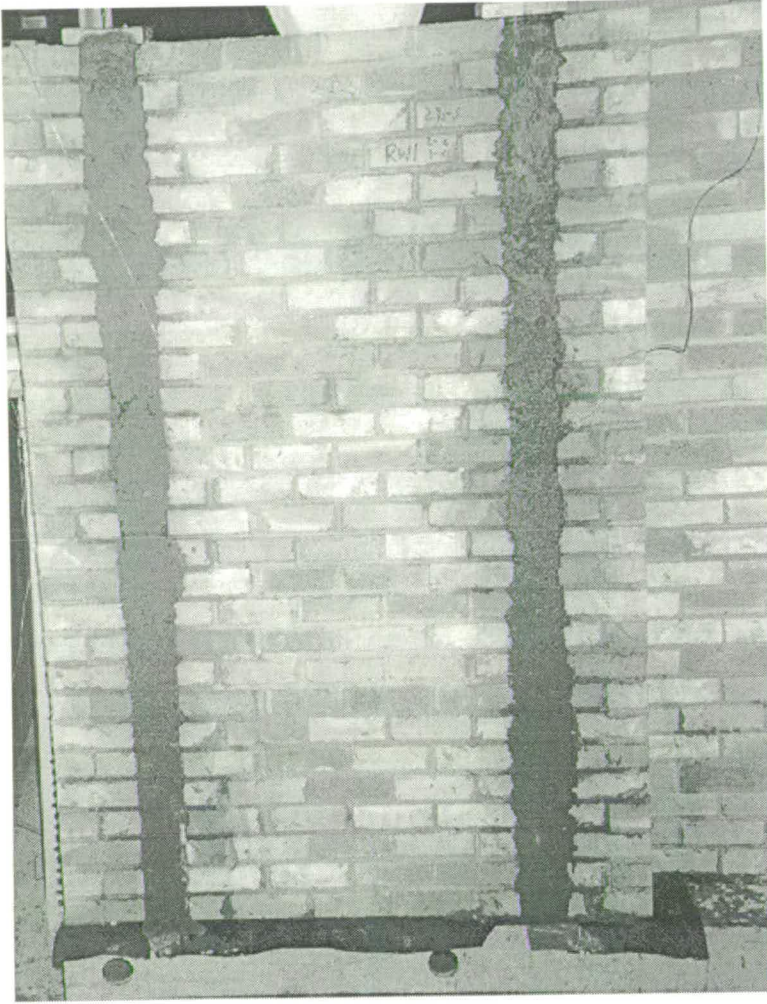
Grouted reinforced brickwork pocket-type wall built on a reuseable steel channel base (RW1)
